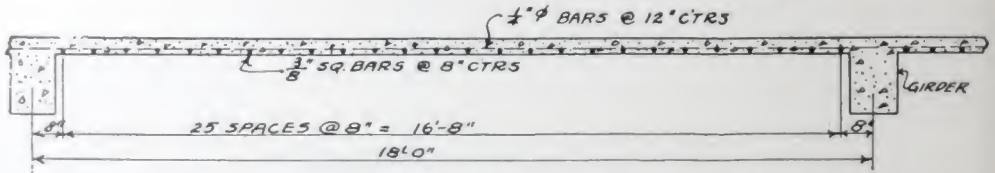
Section through girders and slabs showing typical bar design for slabs.
